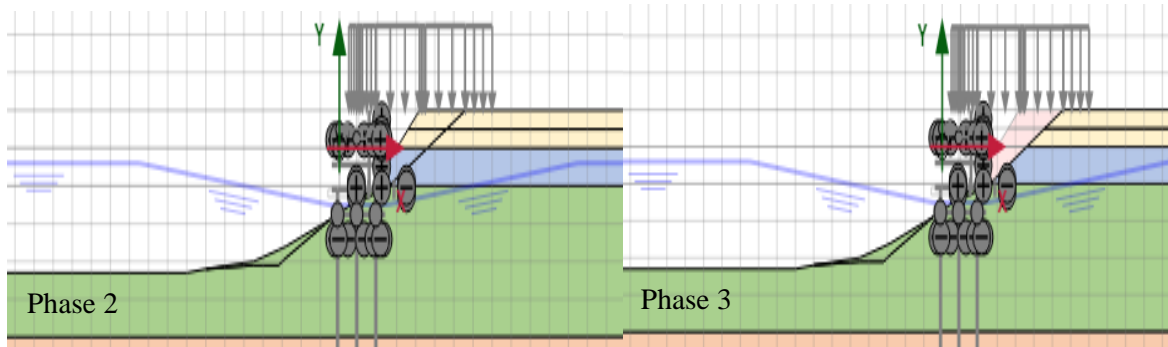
Phase 2 and phase 3 working on the construction pit near the quay wall
